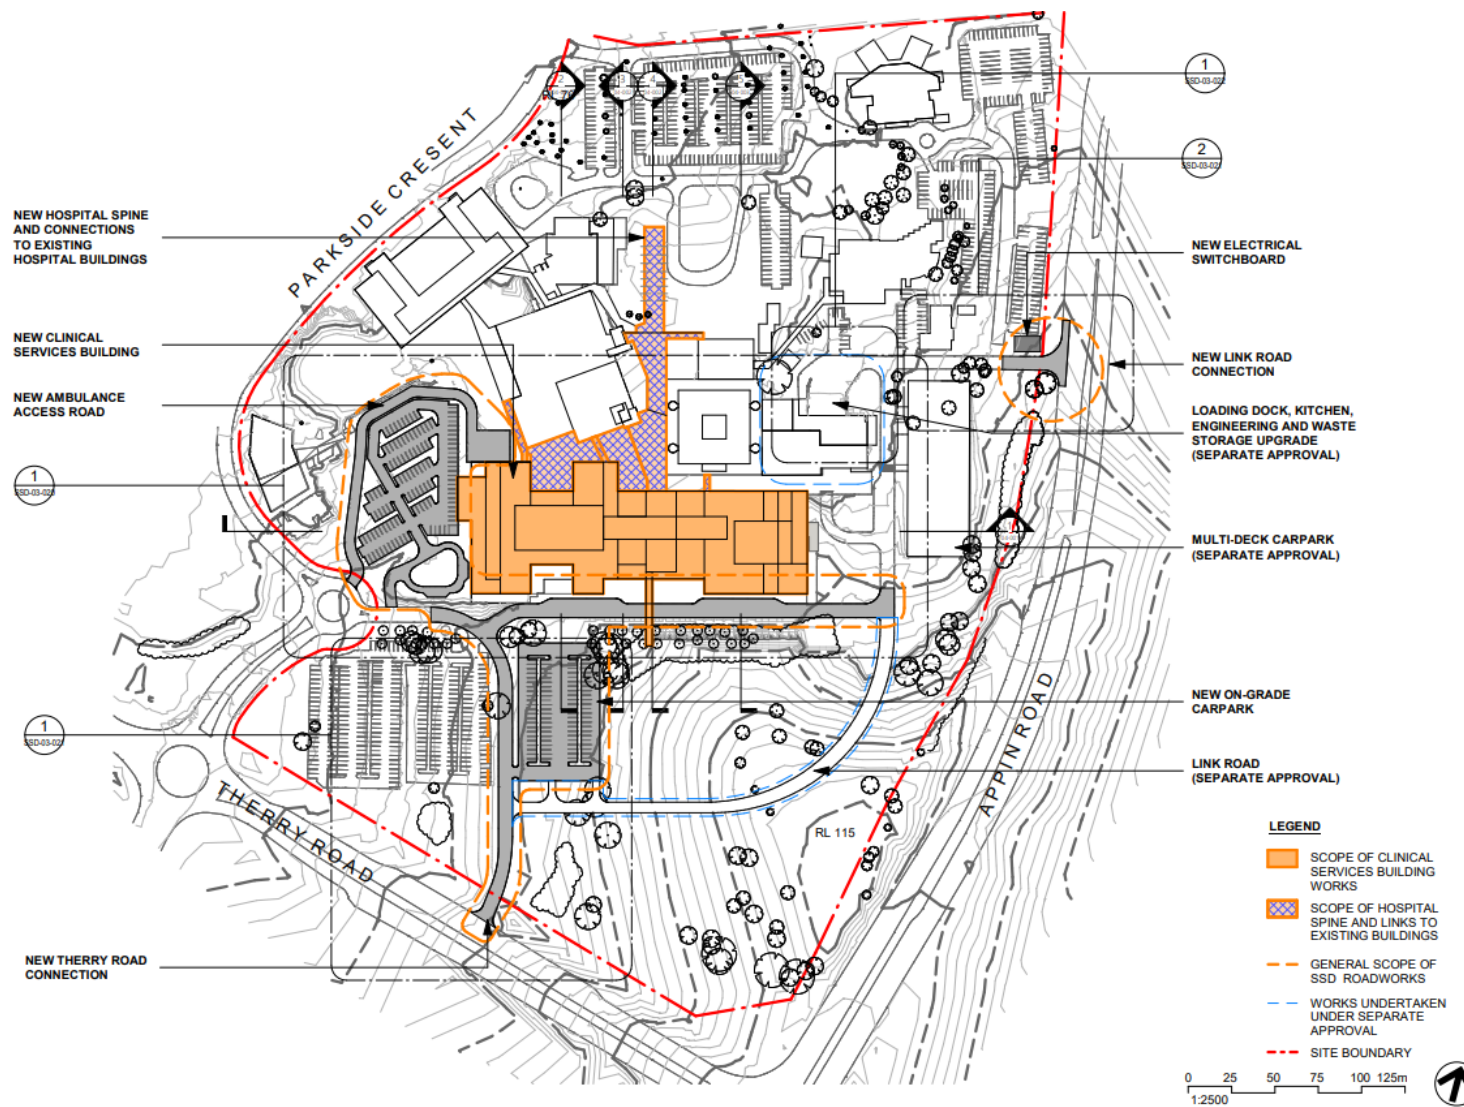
Plan – site plan proposed works (Billard Lece Partnership Pty Ltd, SSD-01-003, Rev F)
